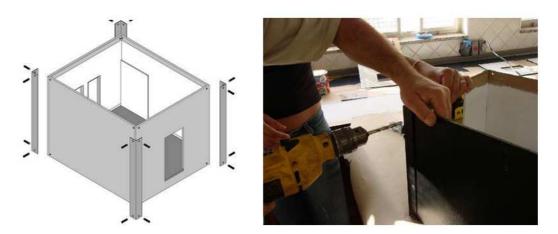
Aluminum brackets and bolts for connecting the walls (rendering and photograph by Gabriela Celani).
